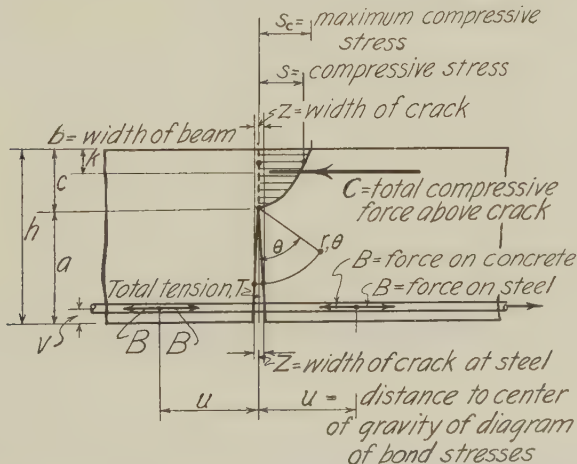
REINFORCED CONCRETE BEAM WITH RECTANGULAR CROSS SECTION. VERTICAL CRACK AT SECTION WITHOUT VERTICAL SHEAR.
